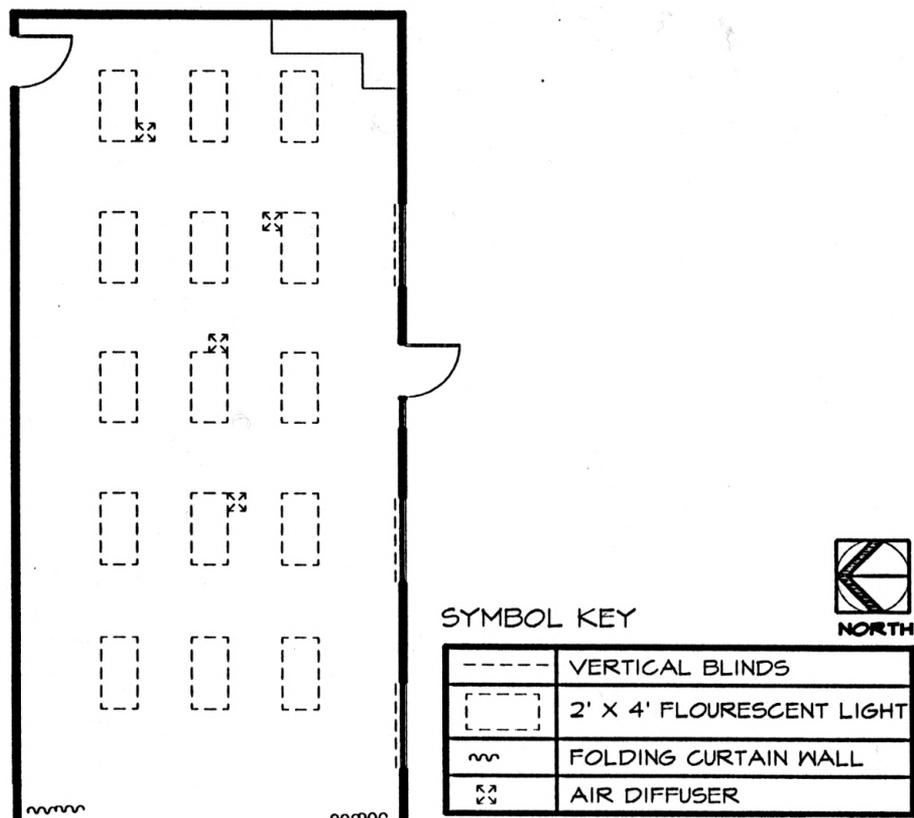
Plan of Skilled Care Dining - Site 3.
